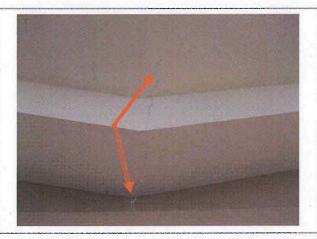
Horizontal cracks at the valley of the concrete eyebrow at the elevator stairwell roof with efflorescence staining below.
